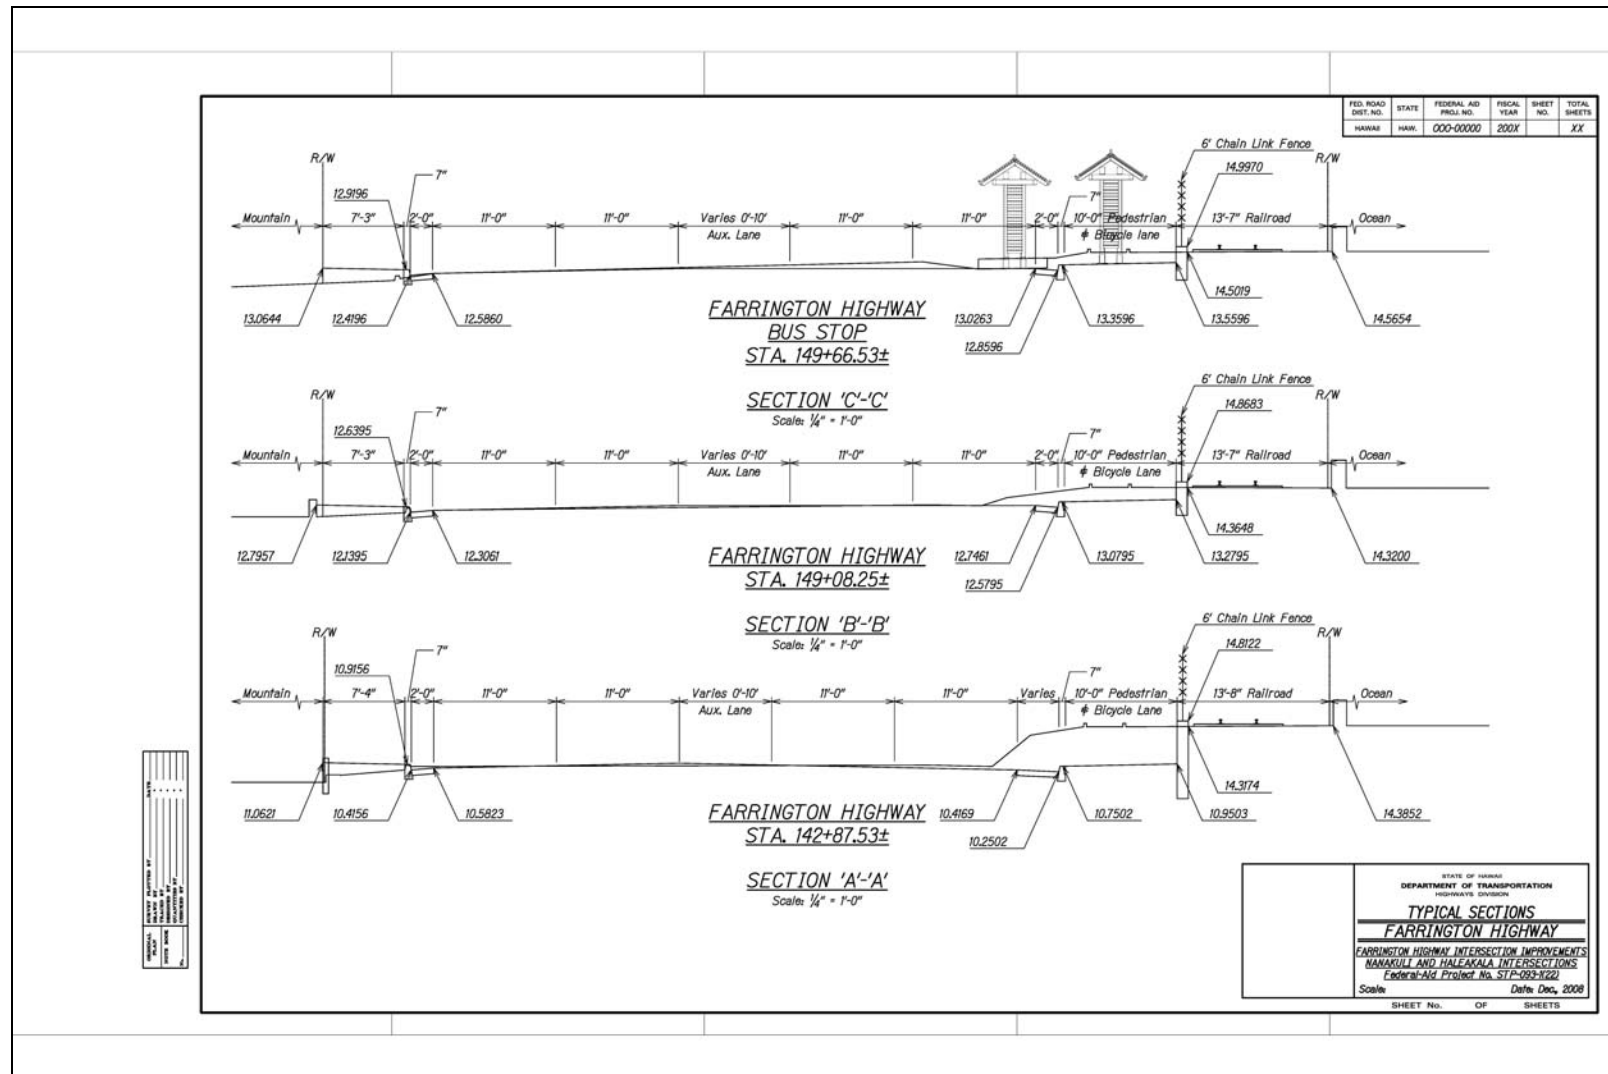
Typical Sections, north portion, showing vicinity of Farrington Highway and Helelua Street (HDOT 2008)
